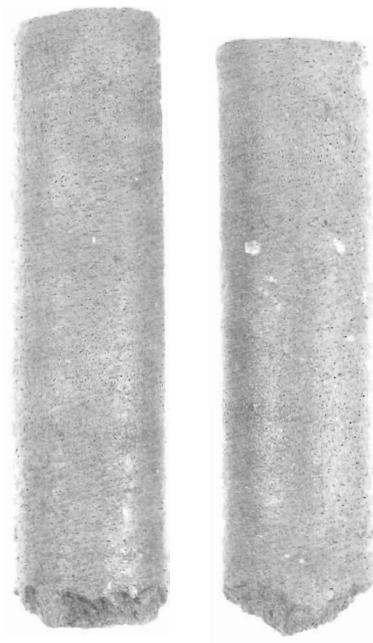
Core samples from hand-cut block 51Y-57, soil-lime. Photo P-214-D-77908
